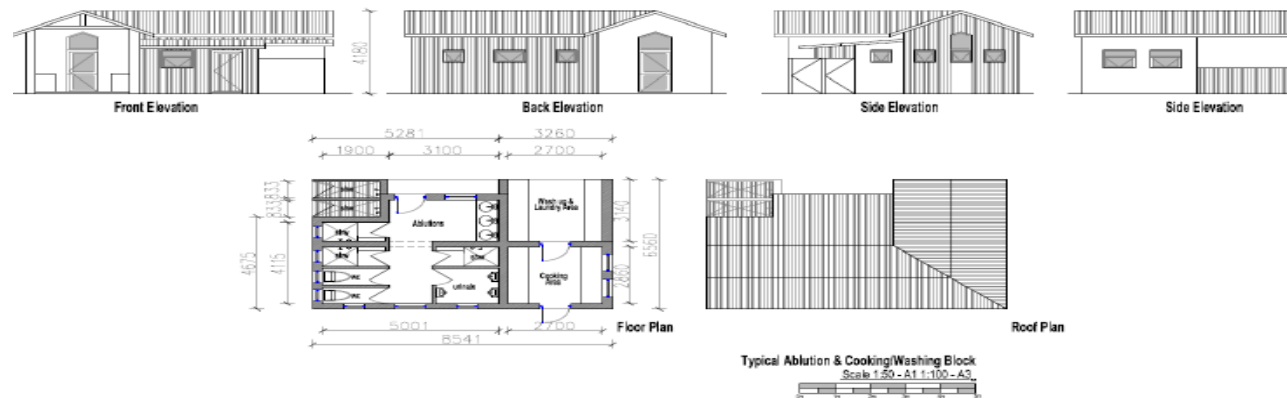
Layout of Ablutions/ Cooking/ Washing block, TMBA Architects, 2023.
